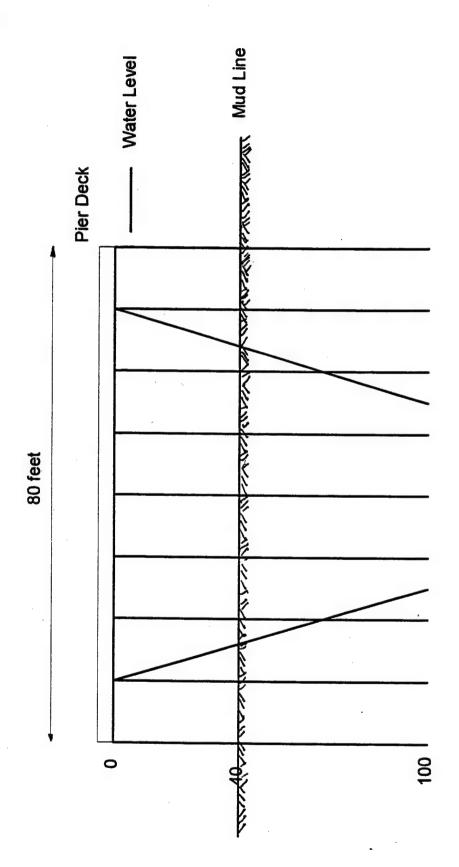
Typical pier with batter piles used in 2-dimensional analysis.
